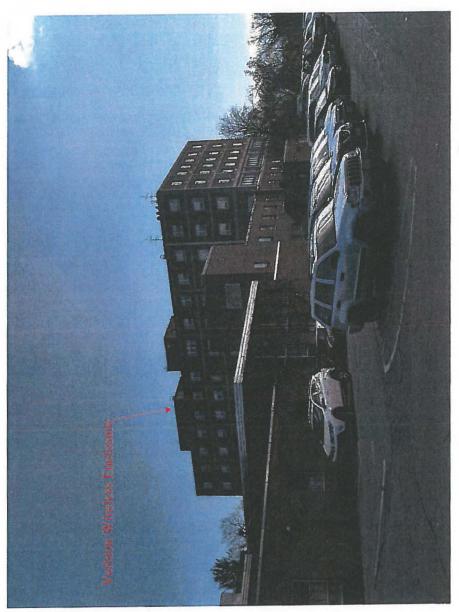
View of Sancta Maria Nursing Facility from rear parking lot
